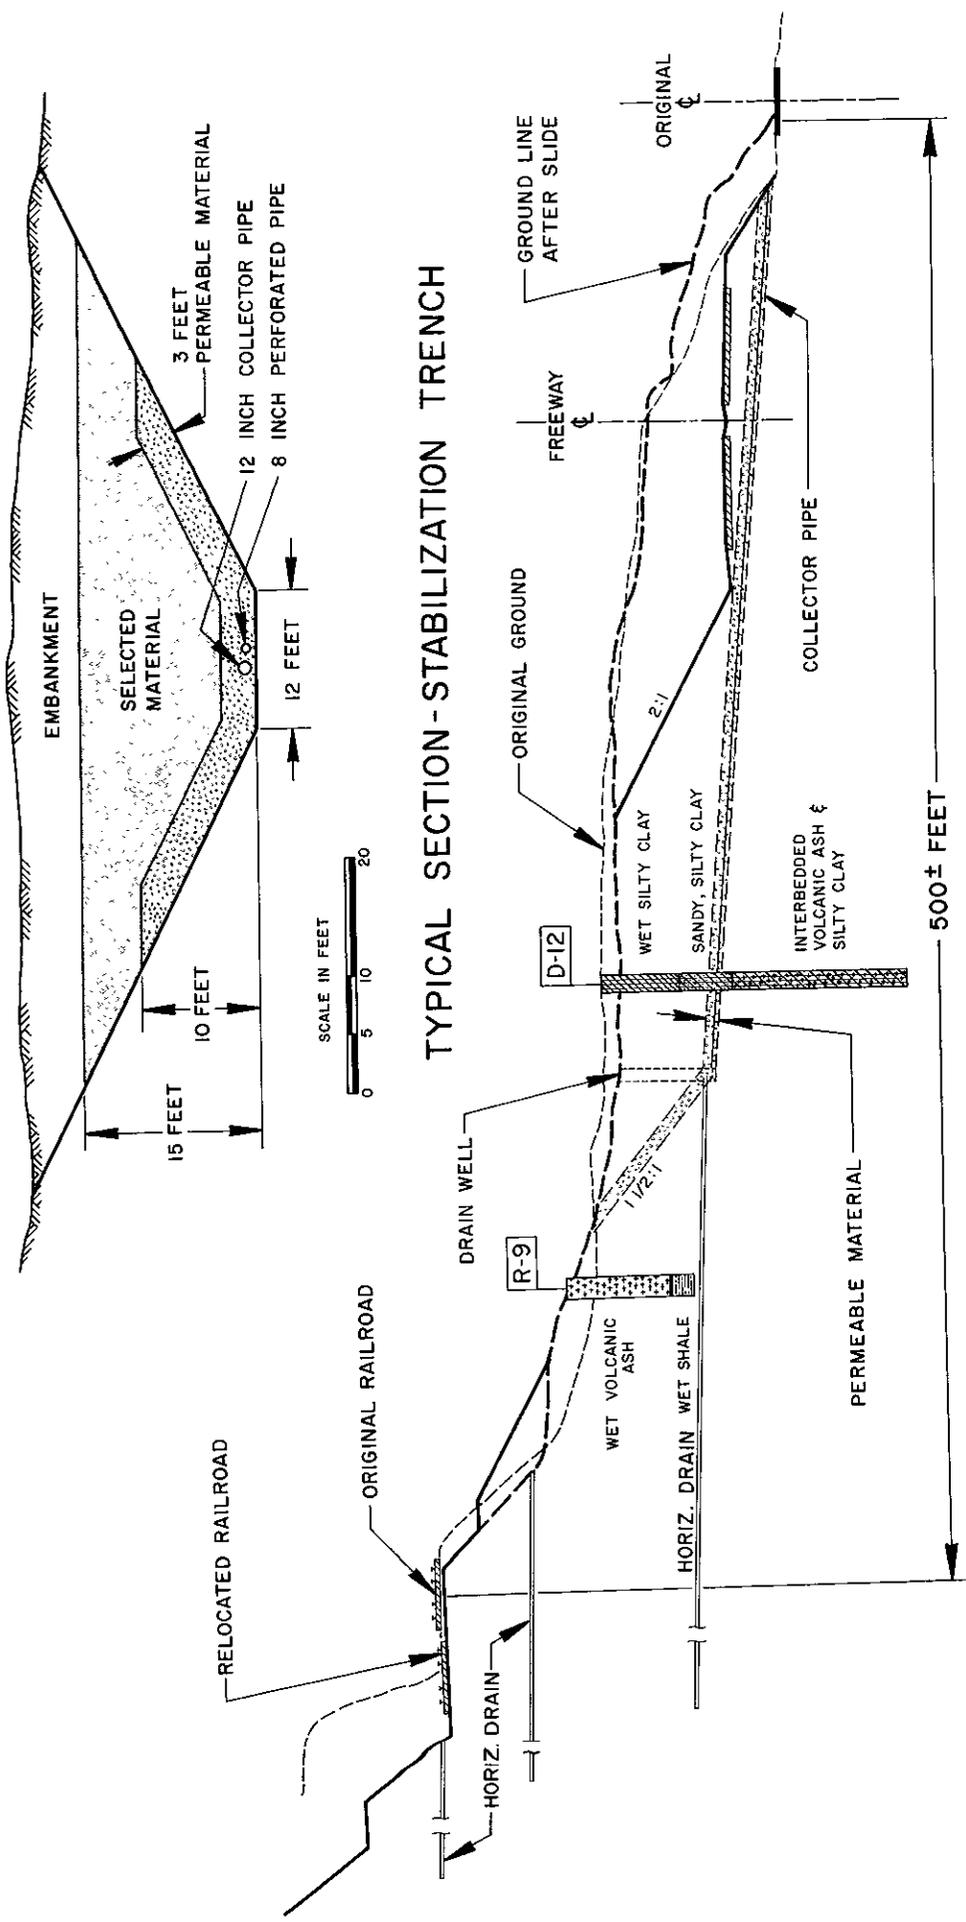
PROFILE AND TYPICAL SECTION OF STABILIZATION TRENCH AT TOWLE SLIDE
